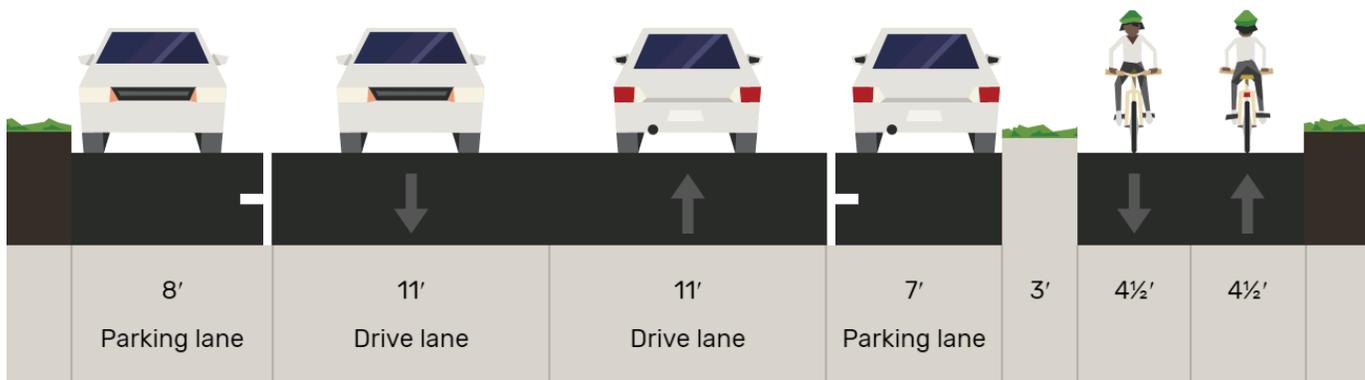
Road 20 – Alternative 2 Cross Section (Facing East)
